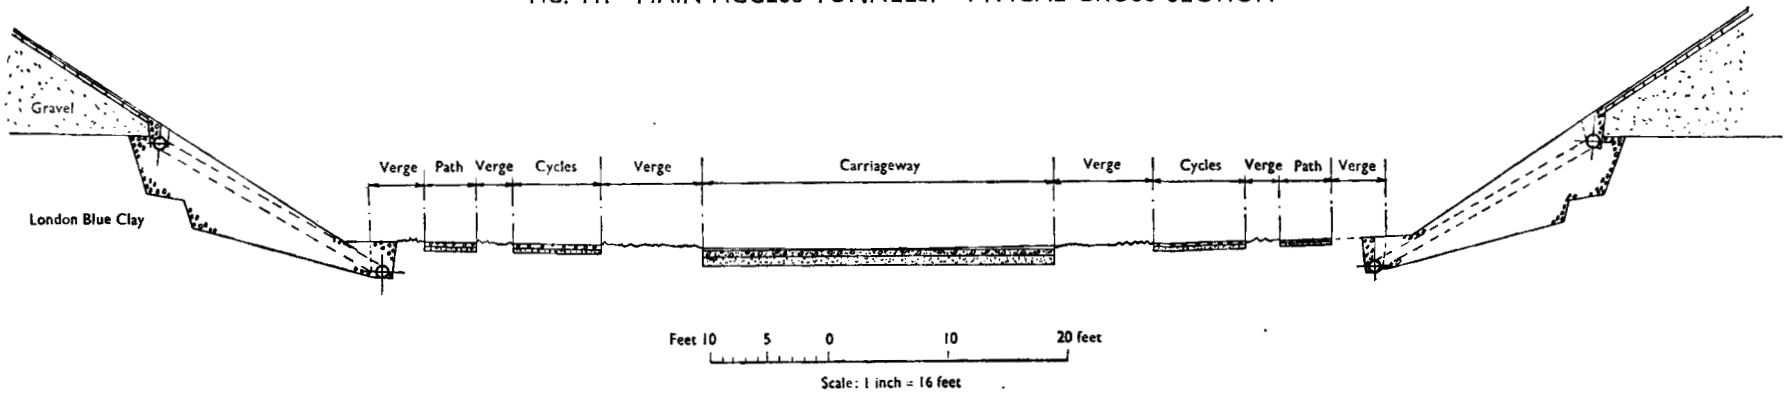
TYPICAL CROSS-SECTION OF MAIN TUNNEL APPROACH SHOWING METHOD OF CONTROLLING SUBSOIL WATER
